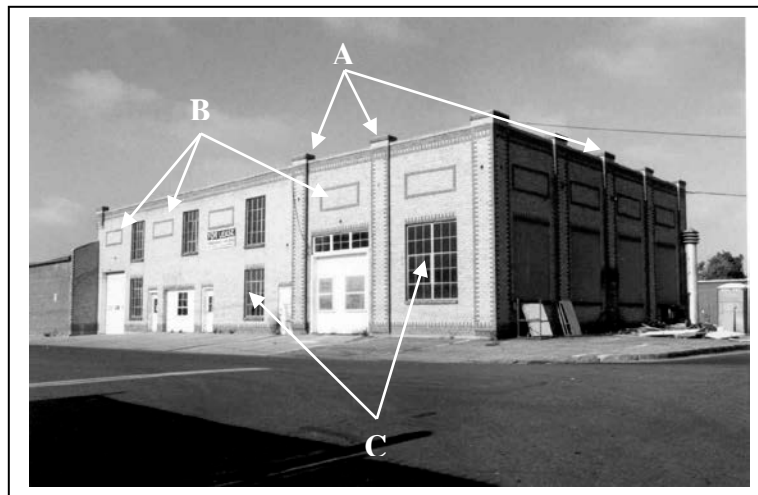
Features include nine (9) projecting brick columns (A), rectangular brick panels (B), and six (6) industrial sash windows (C).
